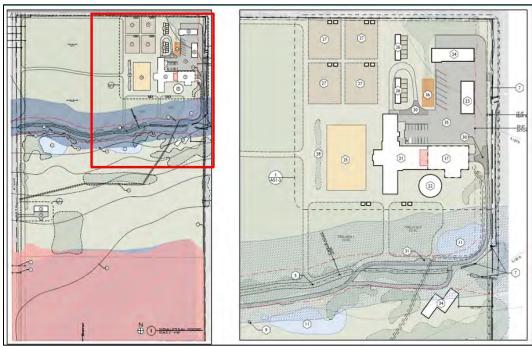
Proposed site plan, with detail of the northeastern portion of the subject parcel.
